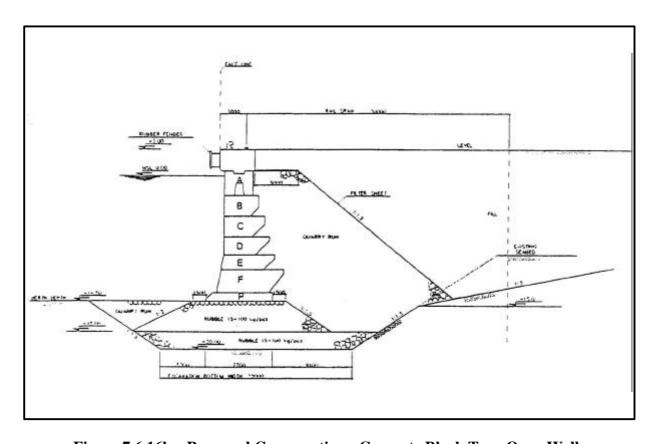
Proposed Cross-section : Concrete Block Type Quay Wall.
